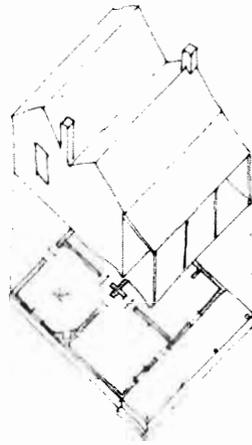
Axonometric and plan of cottage with M-shaped roof, 6 Princess Street, Pietermaritzburg (The author)
